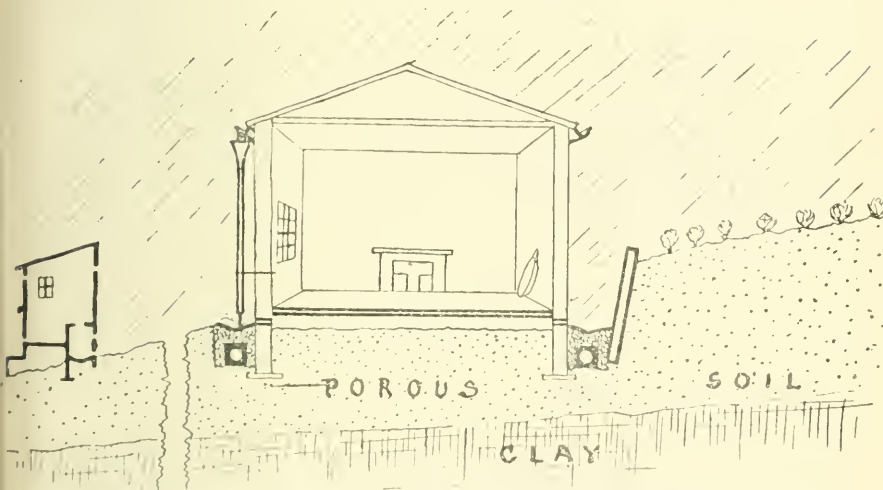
Remedies applied to cottage in fig. 1. Roof watertight and eaves spouted, dry area at back of house, subsoil drain surrounded by rubble laid alongside wall, floor concreted, damp-proof course inserted in walls, and privy reconstructed on lower site.
